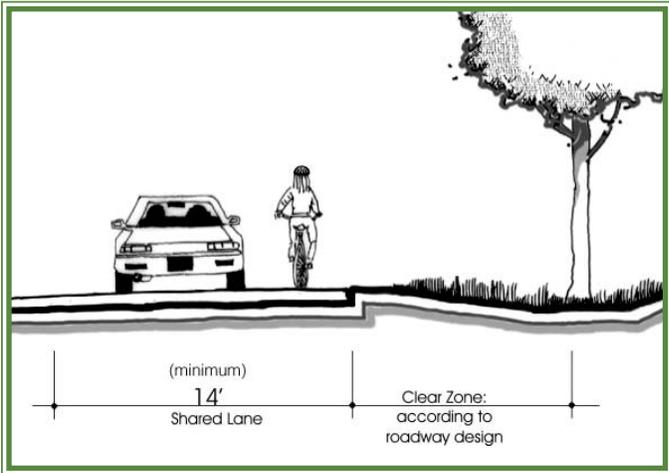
On-Road Biking - Shared Lane Dimensions
